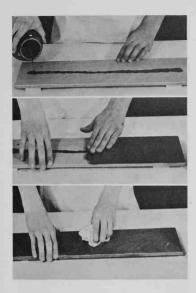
Applying paste filler. Above. Pouring a small amount on the surface, Center. Spreading the filler. Below.
